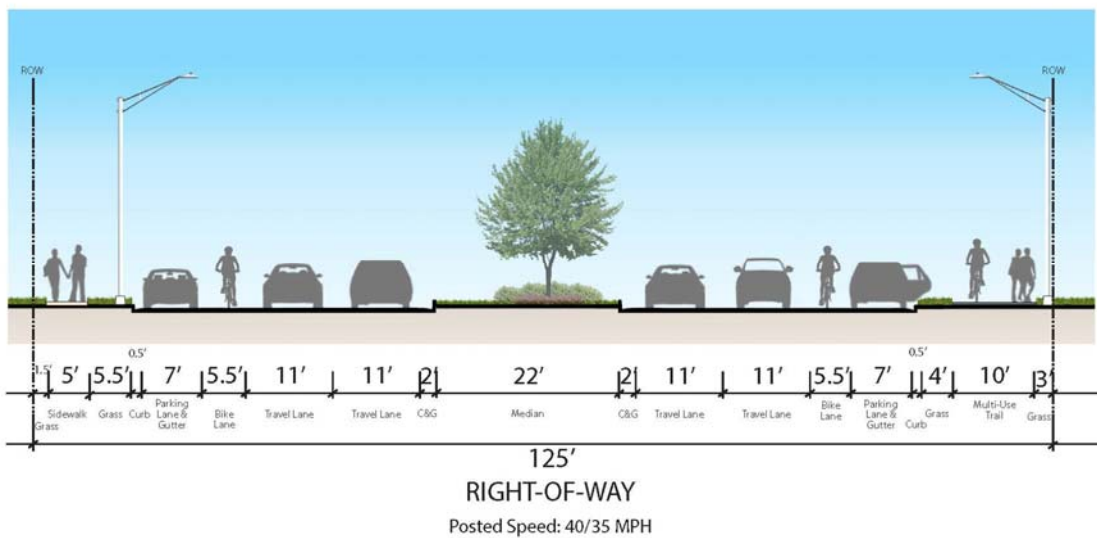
Segment 5 Existing Typical Sections (Bulldog Ln to Bulldog Way)
